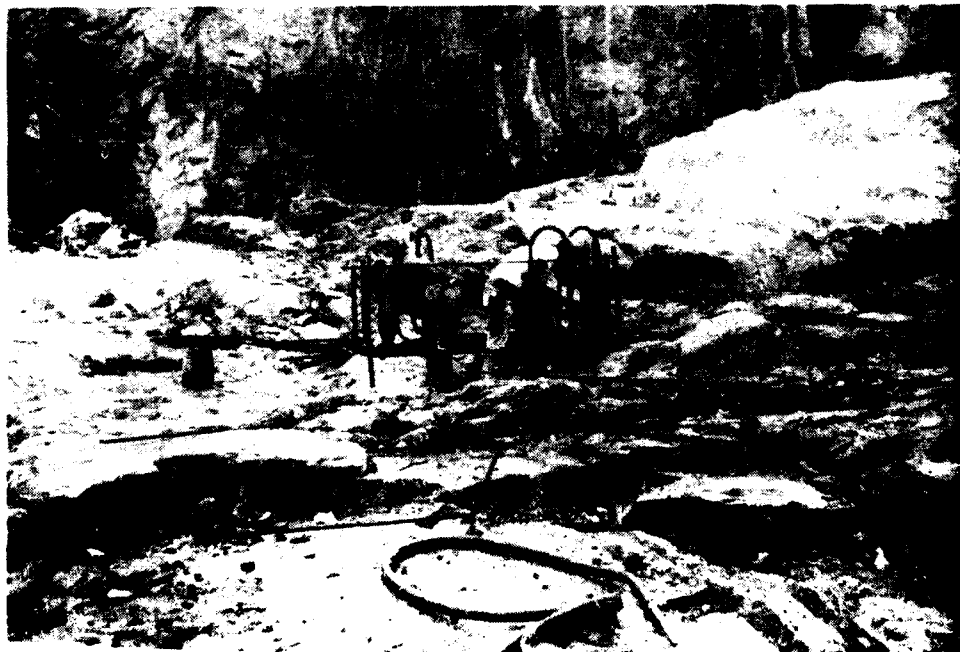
Monolith 26 - Installation of rebar basket on footer foundation (September 1979)
